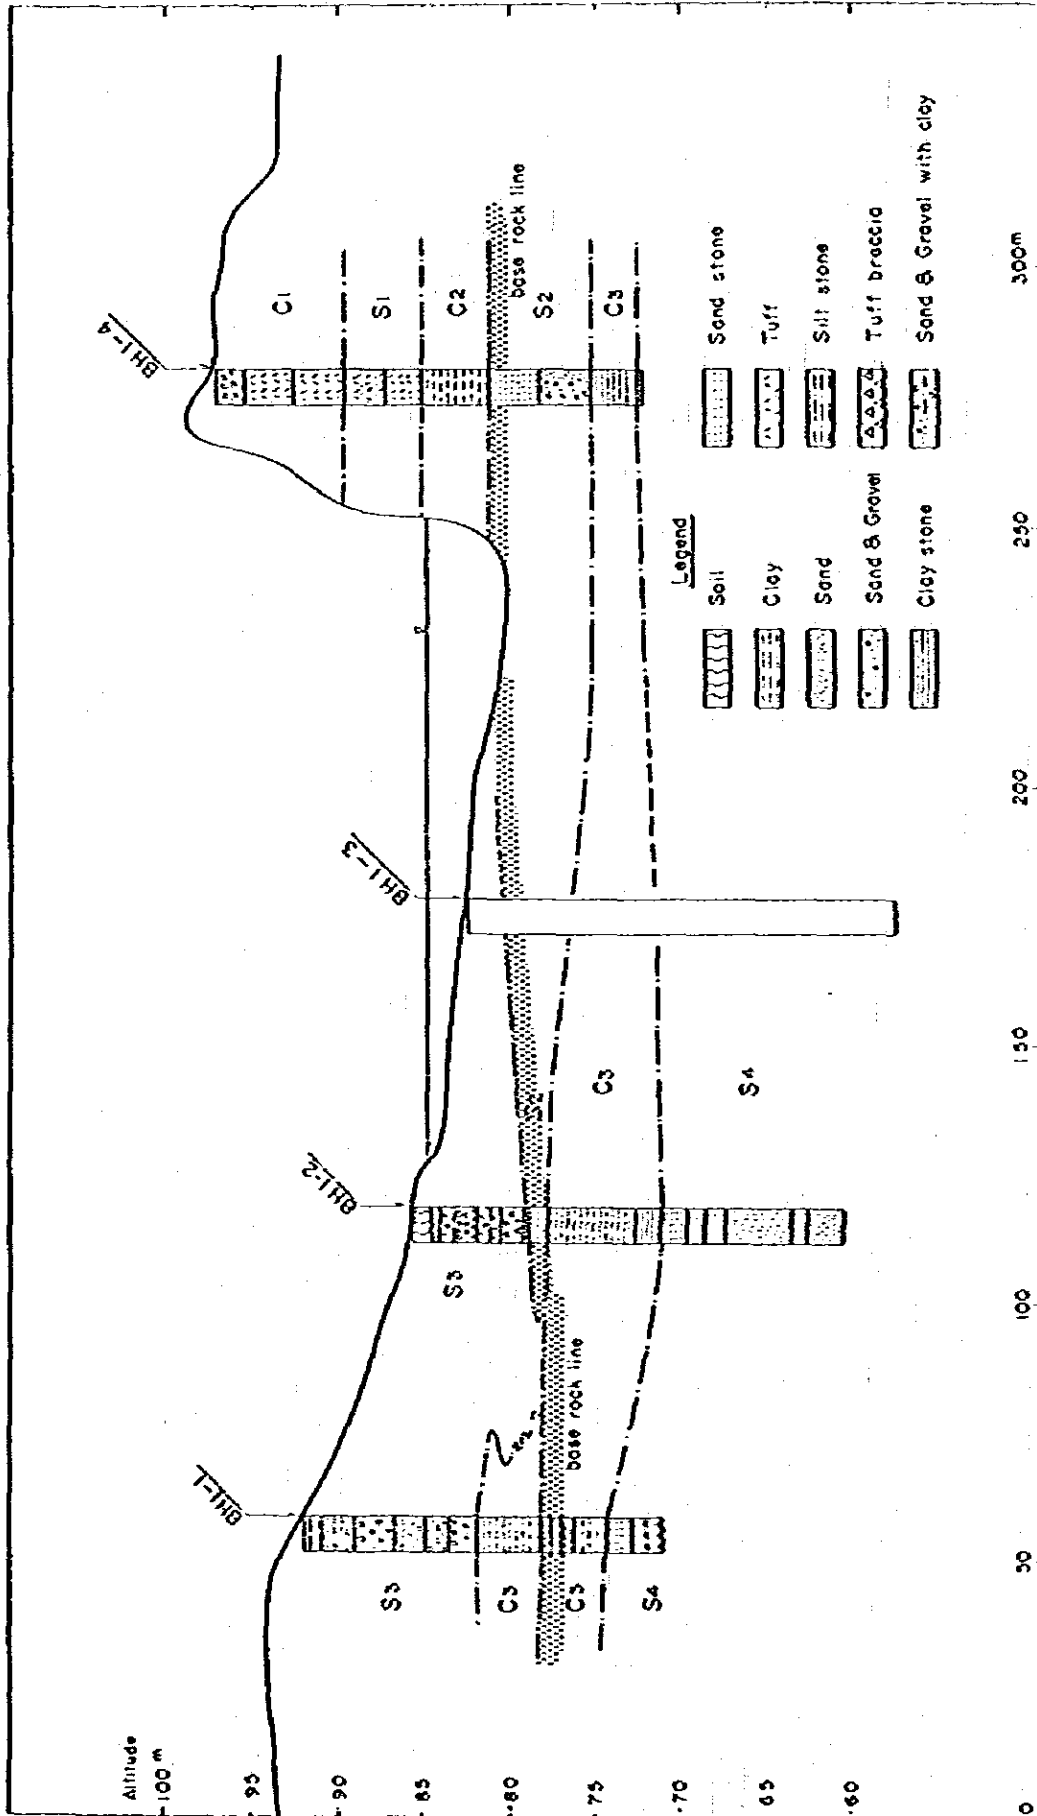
GEOLOGICAL CROSS SECTION OF PRACAK SITE (Section-B)
